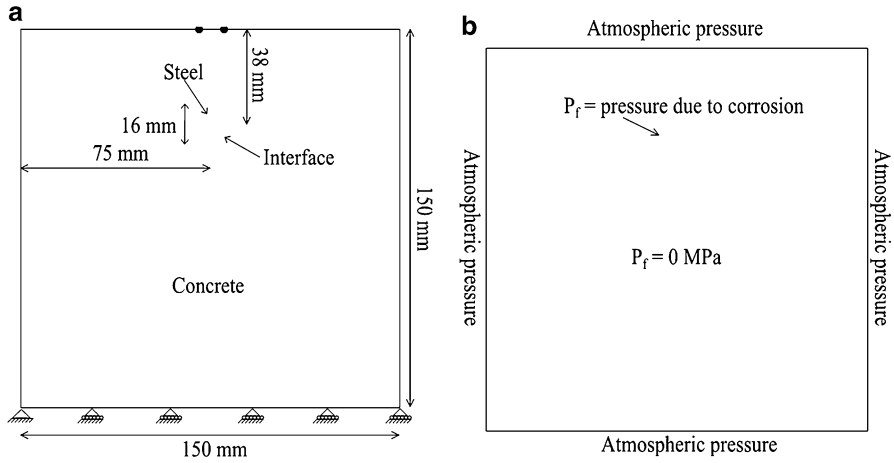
Concrete specimen 3 according to Andrade et al. (1993): (a) Mechanical geometry and setup, (b) transport boundary conditions
